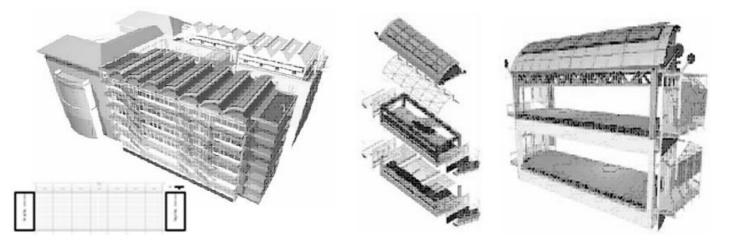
Column-free, flexible floor plan, perspective, modular design, stacked bays and solar-thermal collector arrangements for the new wing of the Building as Power Plant/Invention Works
